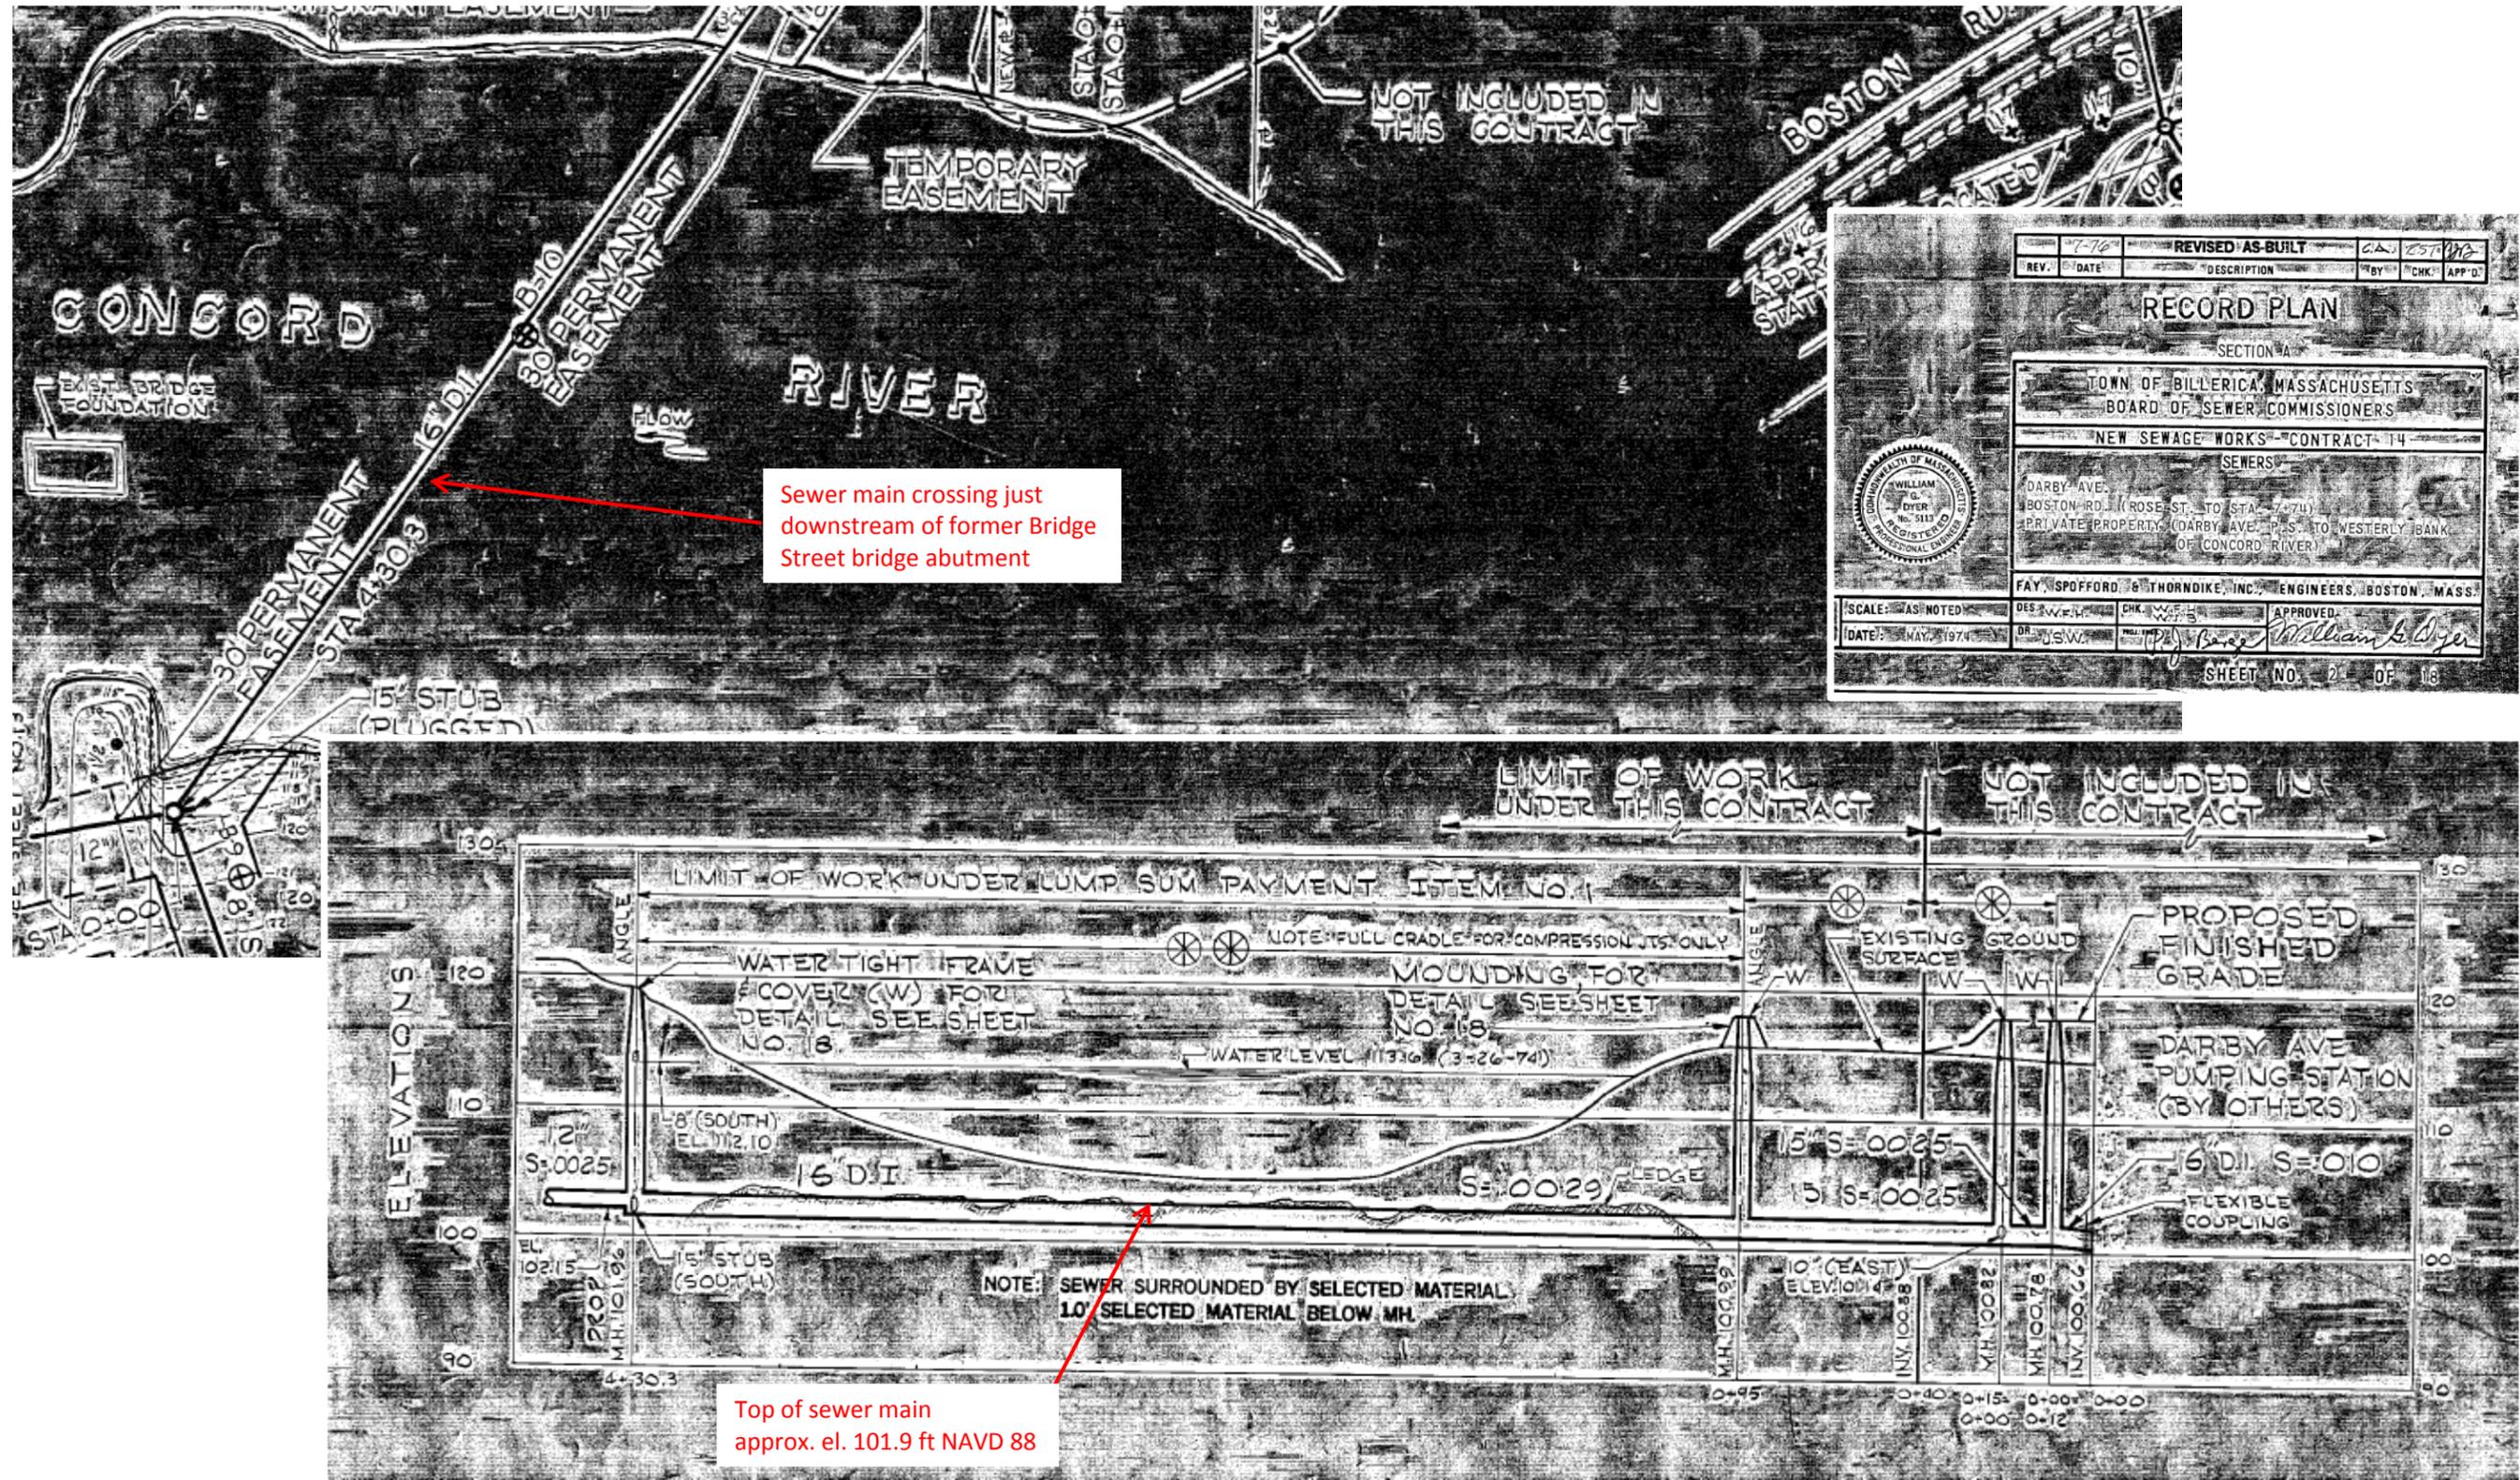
Pollard Street Bridge Plan and Profile Drawing
